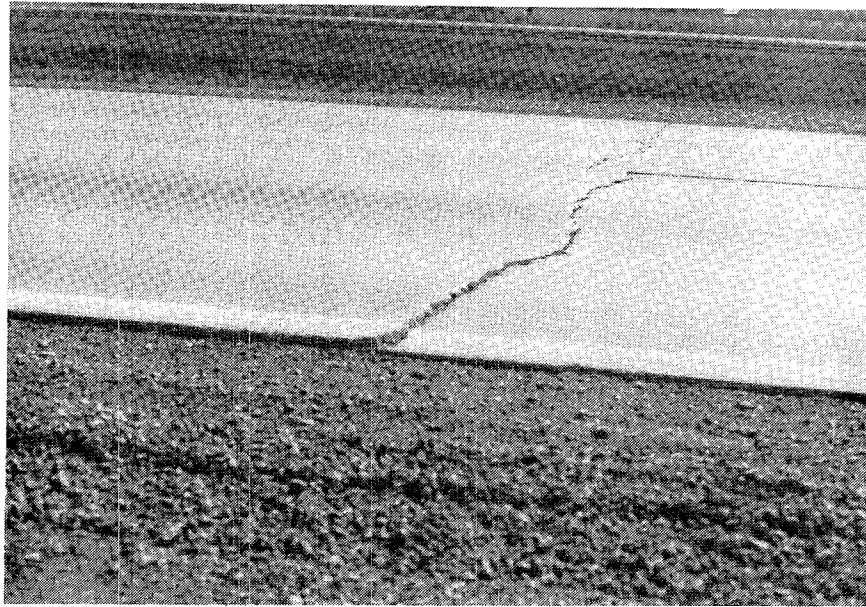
Illustration of transverse cracking rated as "severe" with steel rupture and crack faulting (JRCP-12-CAN).
